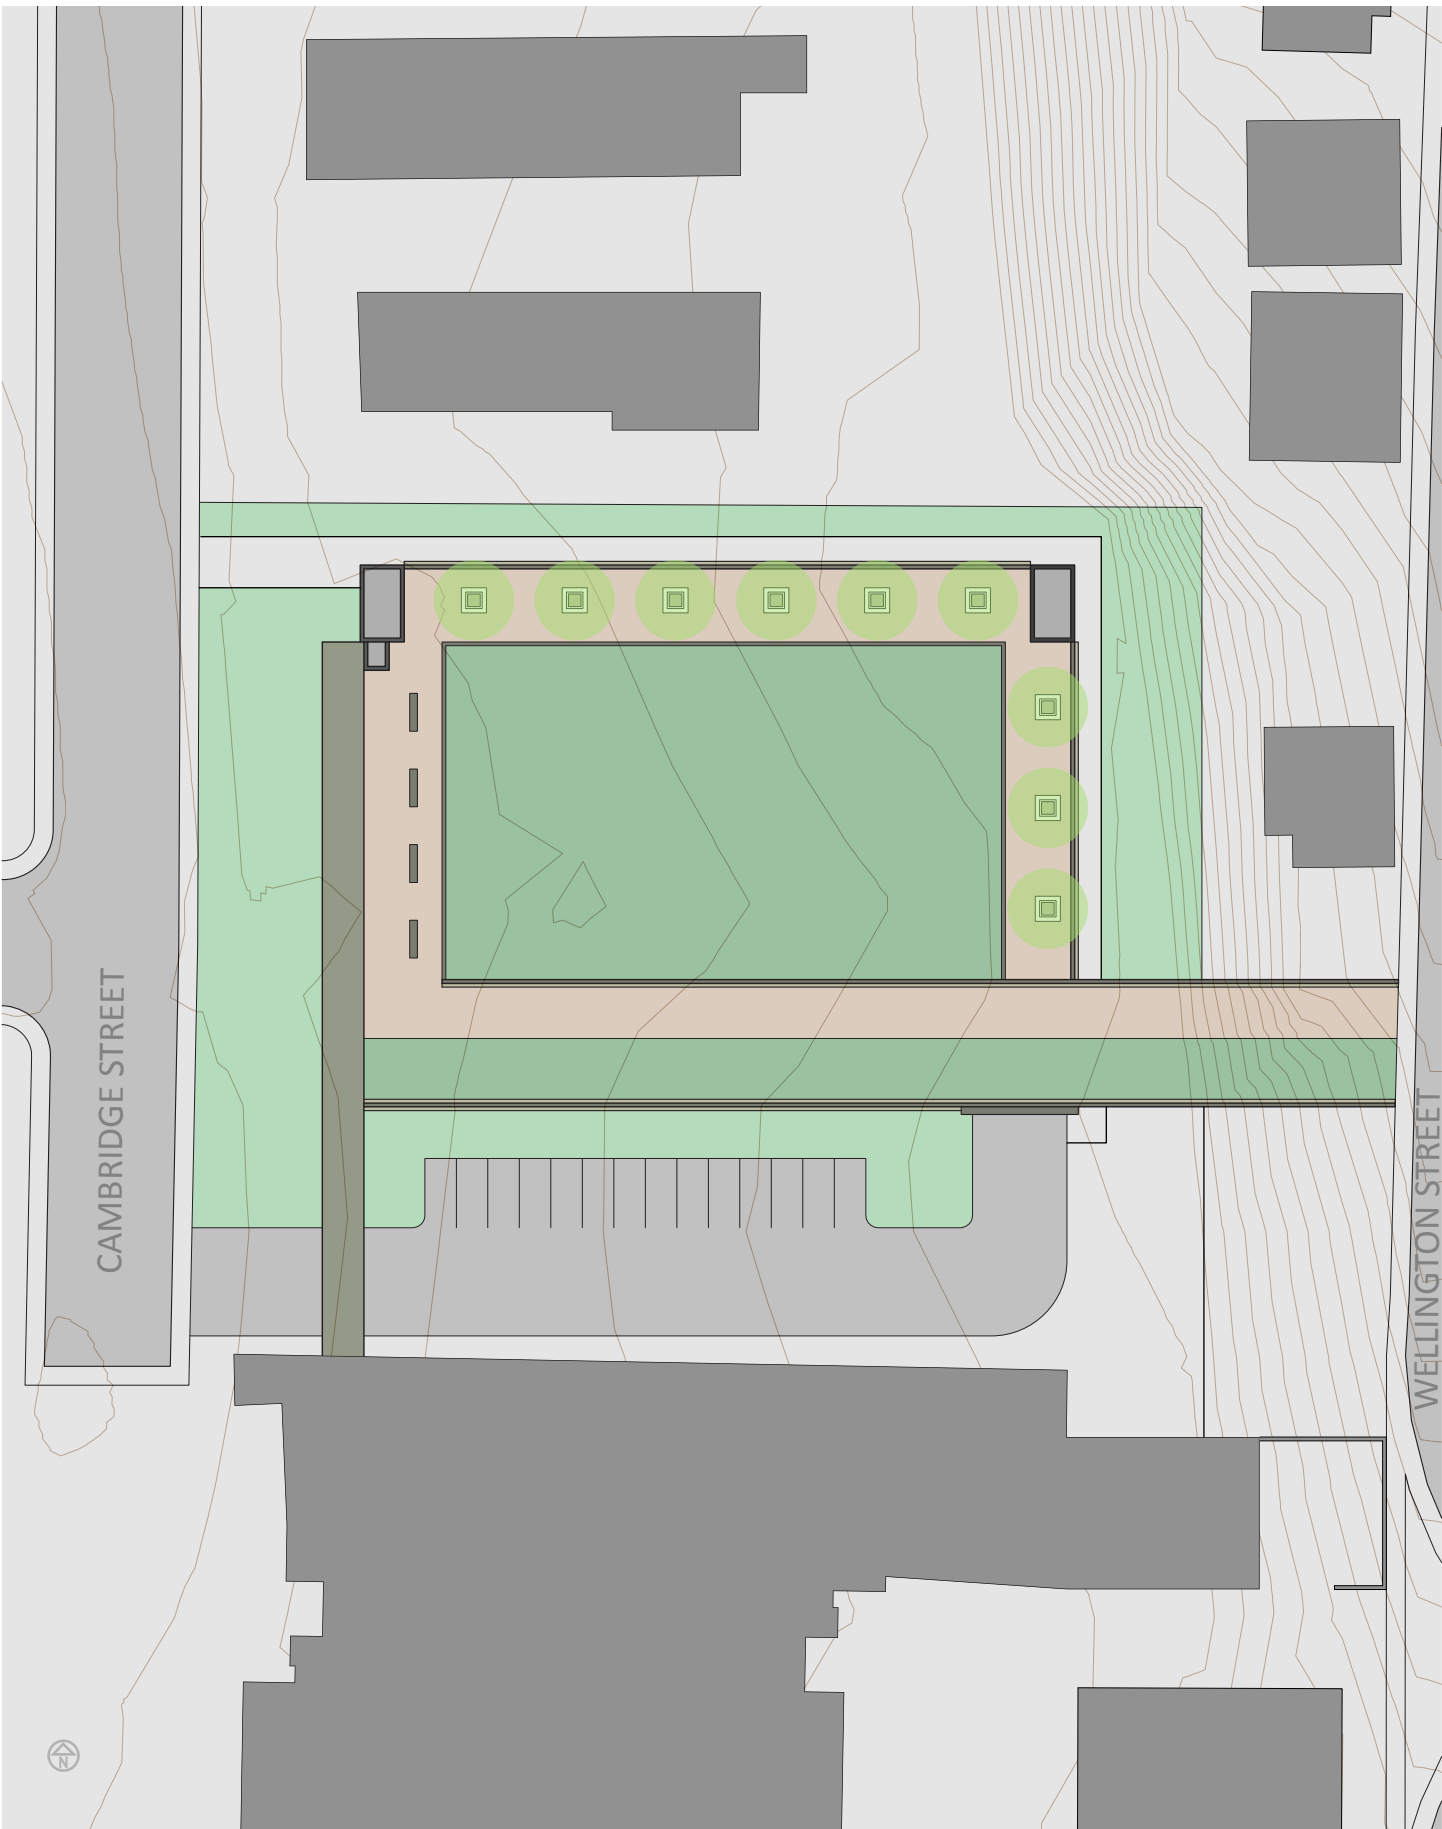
Siteplan of the proposed City Hall Parking Structure (1:600), showing ntensive roof with community dogpark, connected to the sidewalk of Wellington St.
